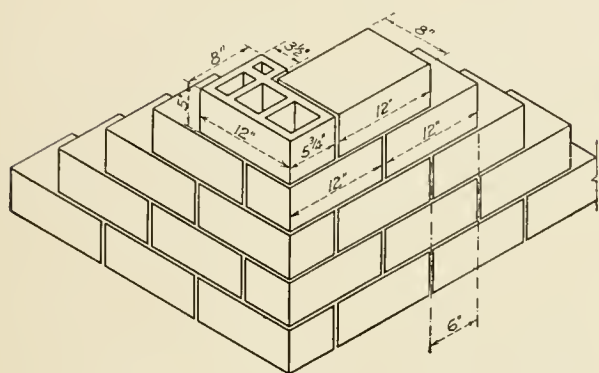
Bond on 8" side construction tile wall, using special corner tile.
